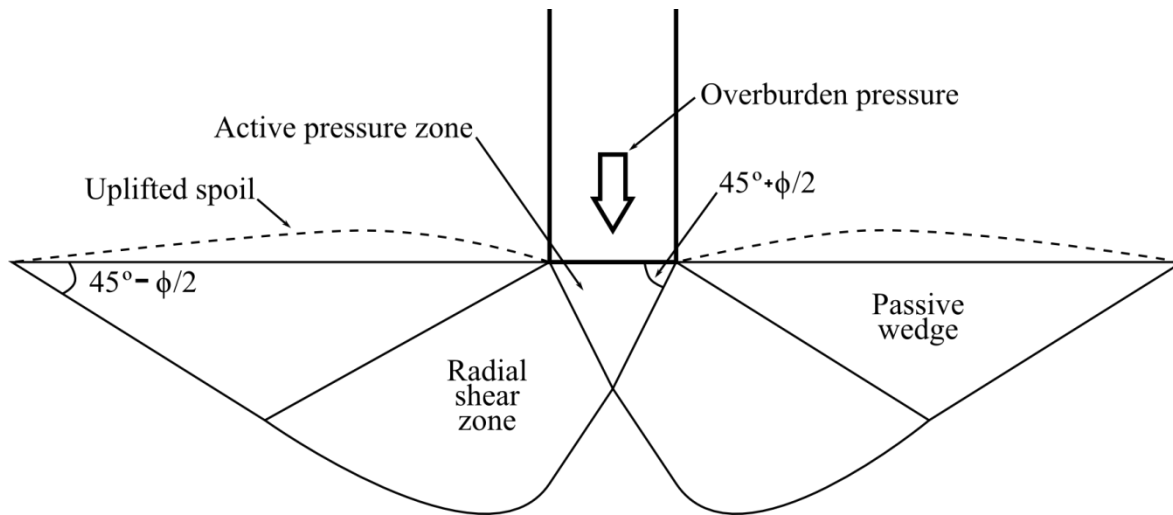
Ideal failure mechanisms in soil due to a foundation using Prandtl's theory. Noted are some angles between certain planes of failure, where ϕ is the angle of internal friction [92], [93].
